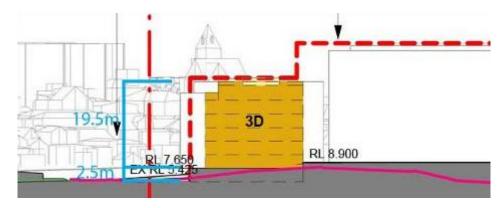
Section through Building 3D at the portion where the ground level sits 2.5m above The Crescent.
